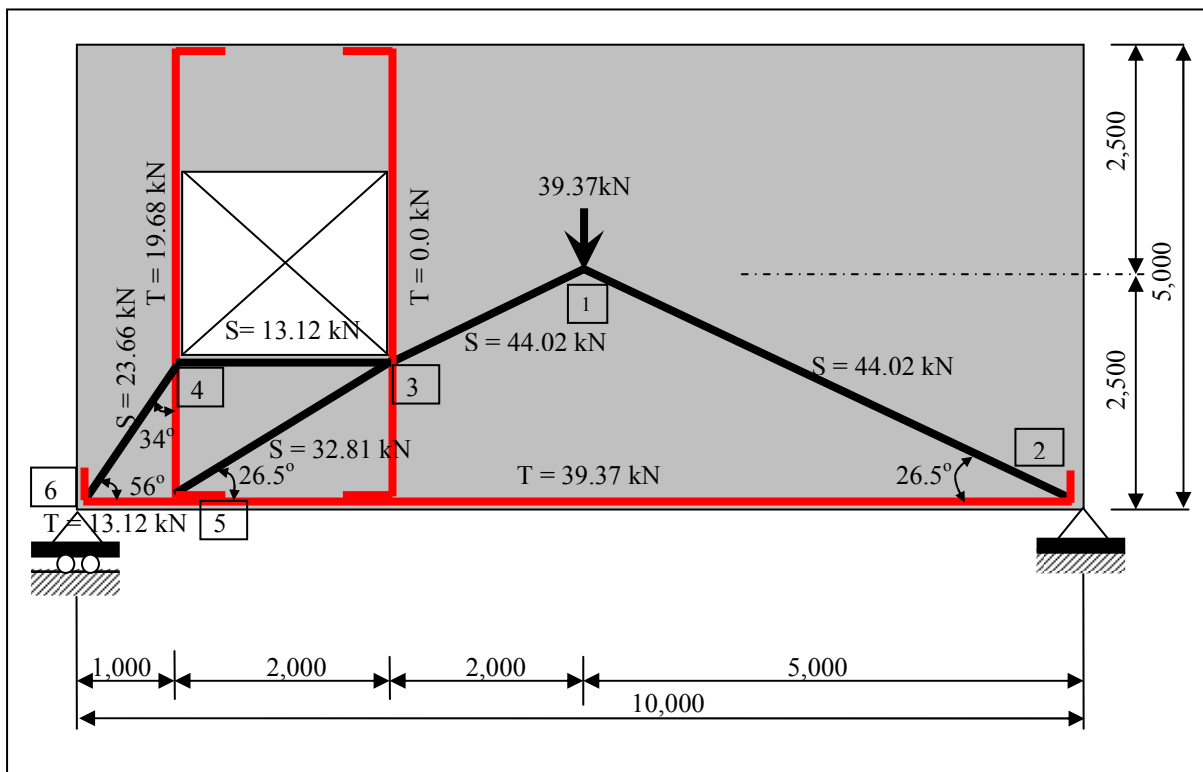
Strut-and-Tie truss model for downward north/south earthquake load
